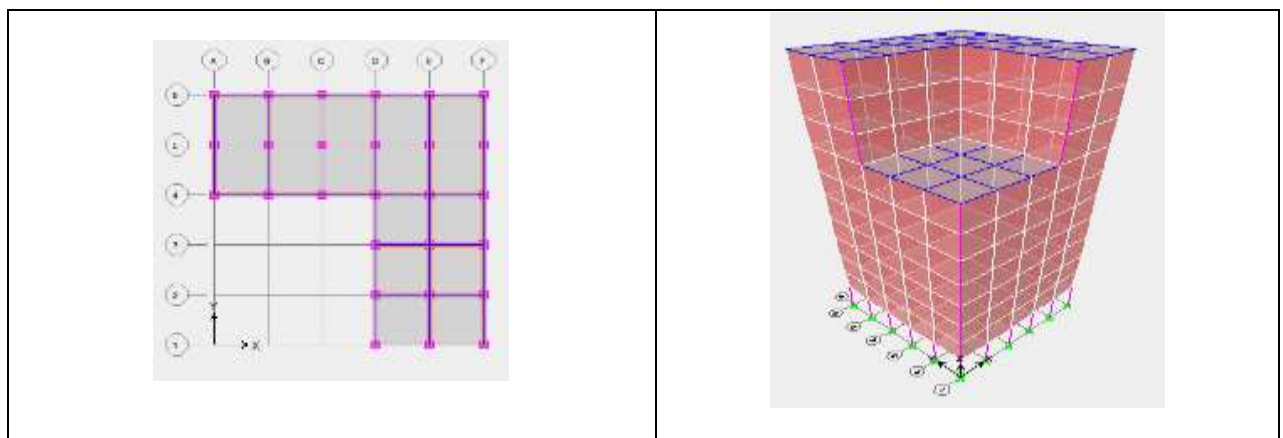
Plan Layout and 3D view Asymmetric building of Model-2
